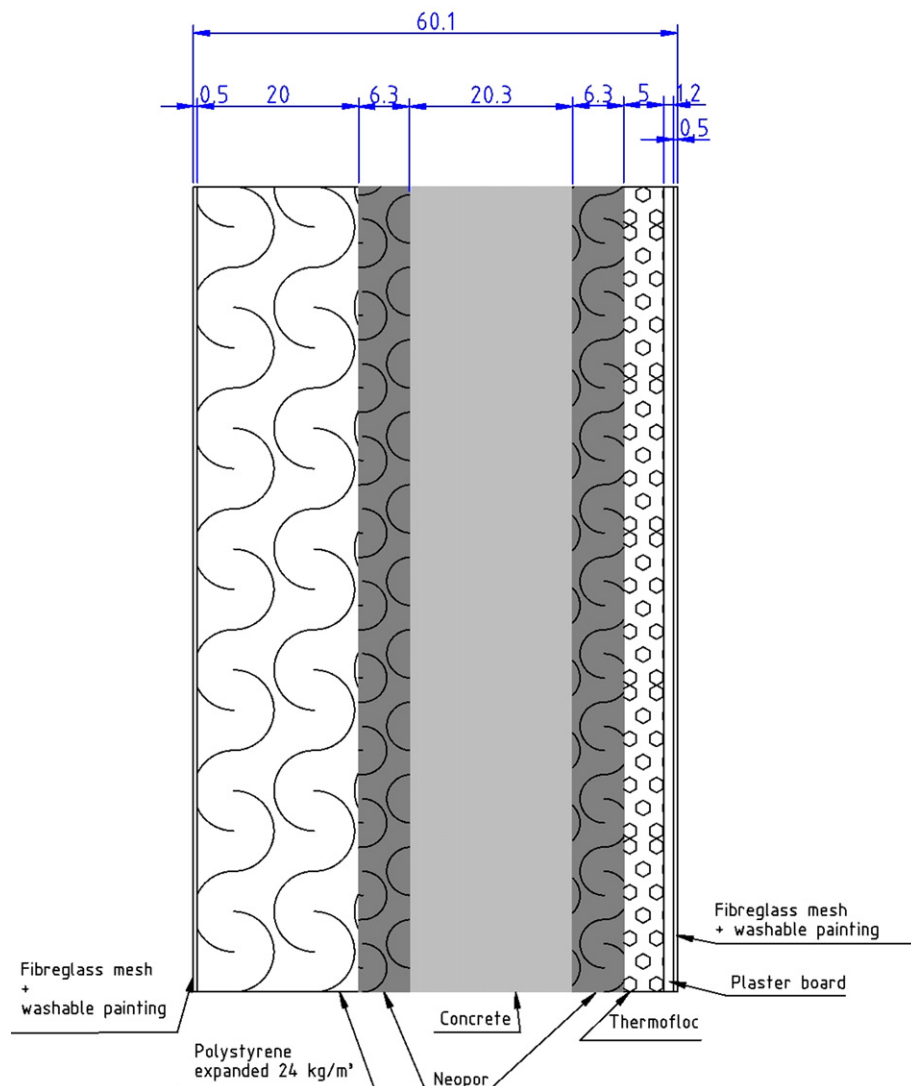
Layers of an external wall – with AMVIC System (Neopor layers). Sizes in centimeter.
